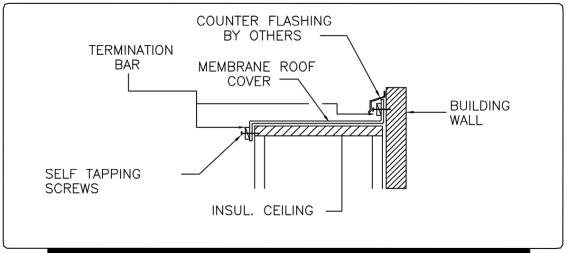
TYPICAL MEMBRANE COVER INSTALLATION WITH ADJACENT WALL
